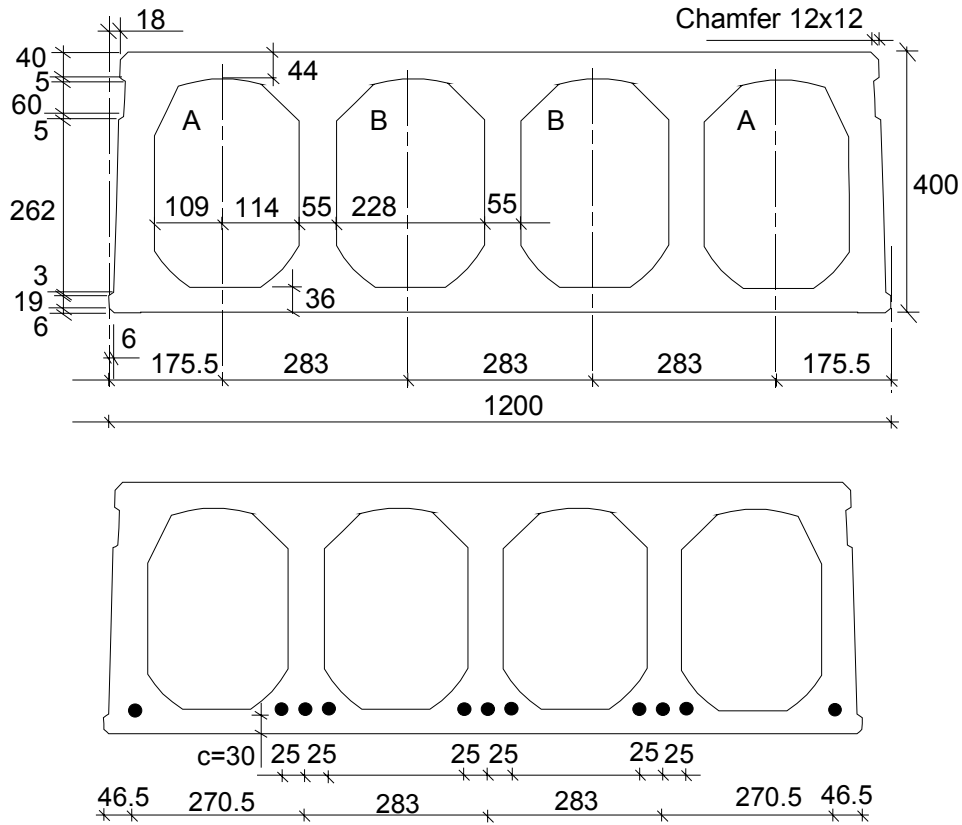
Nominal cross-section and location of strands in slab units. c refers to concrete cover below the strand.
